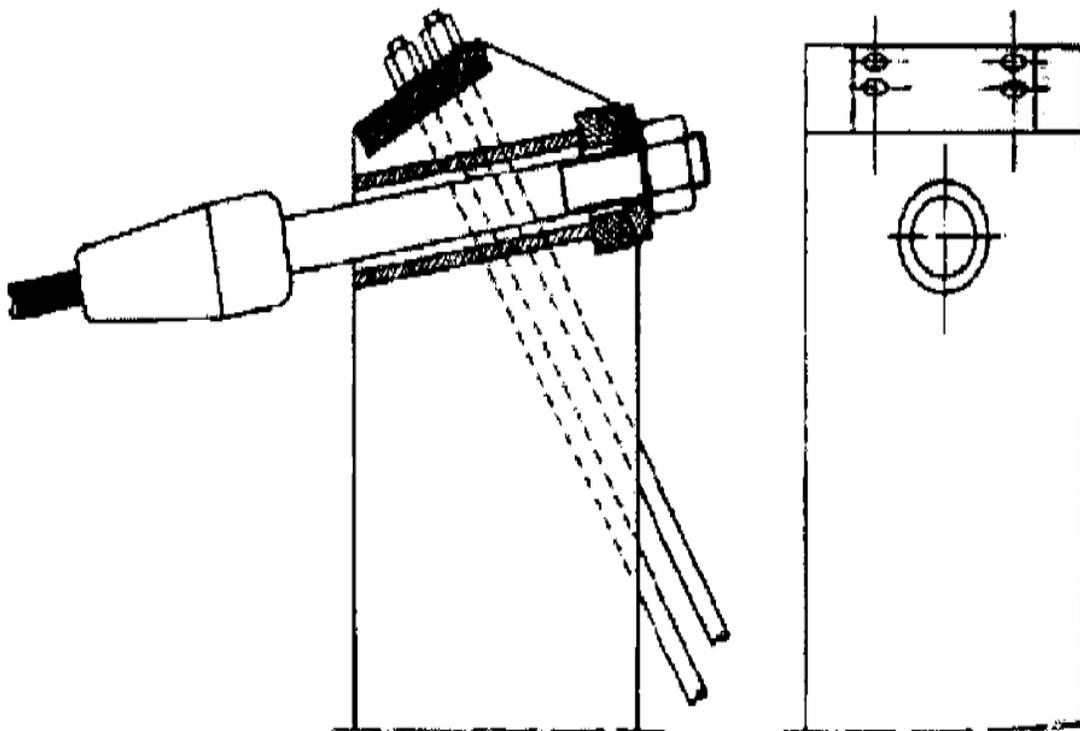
Attachment of cable with socket terminal to top of concrete column
